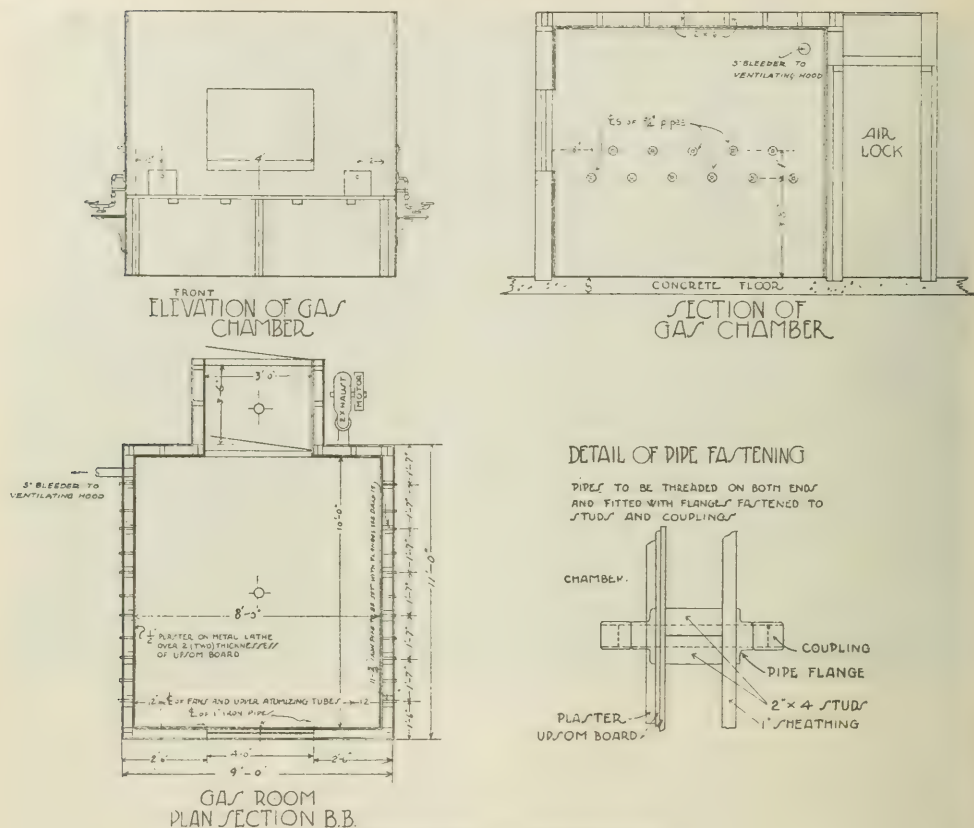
FIG. XII—ELEVATION AND PLAN OF GAS CHAMBERS
